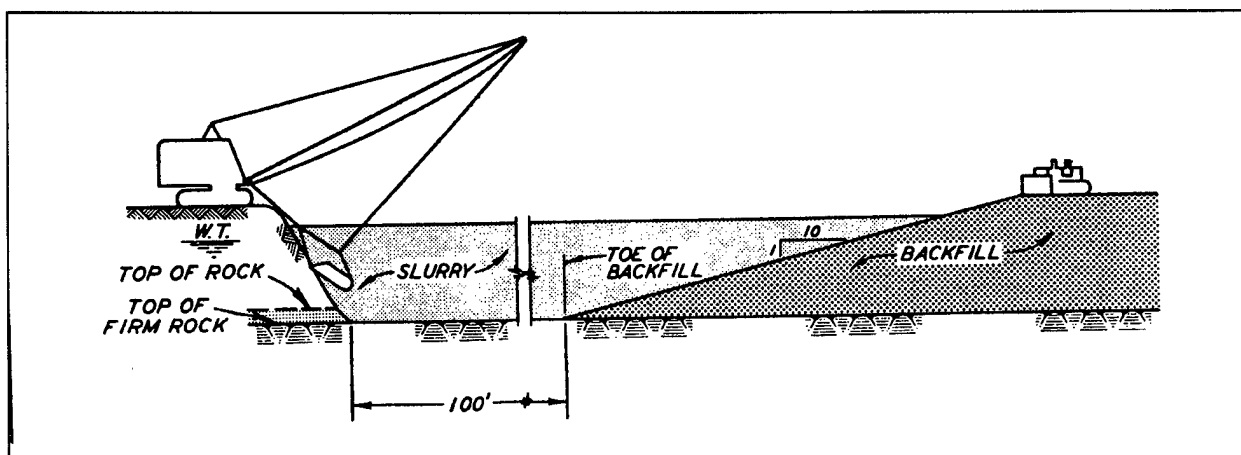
Progressive excavation and backfilling scheme for slurry trench construction
